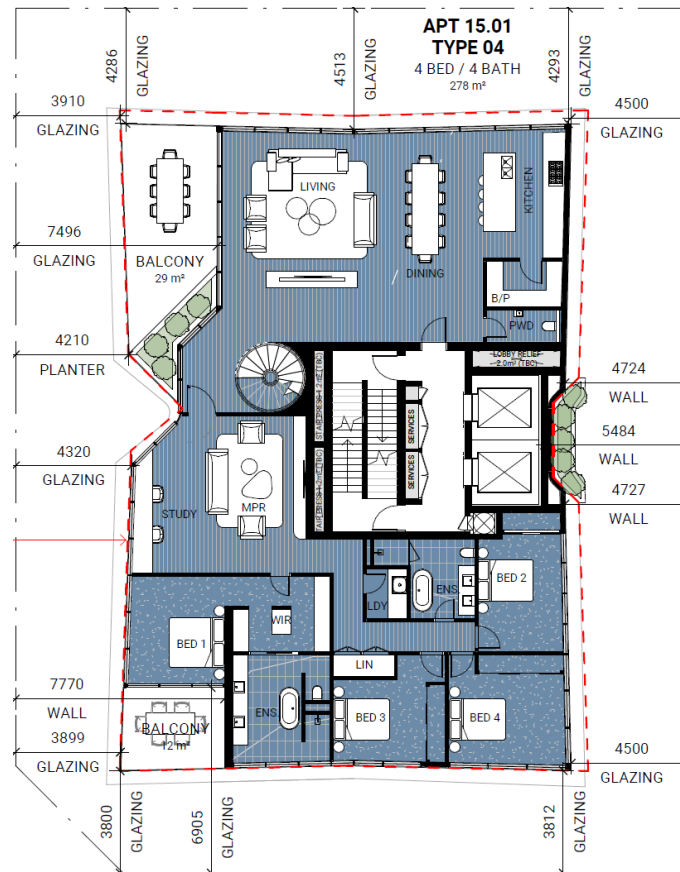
Proposed Level 15 Floor Plan (Source: Plus Architecture)
